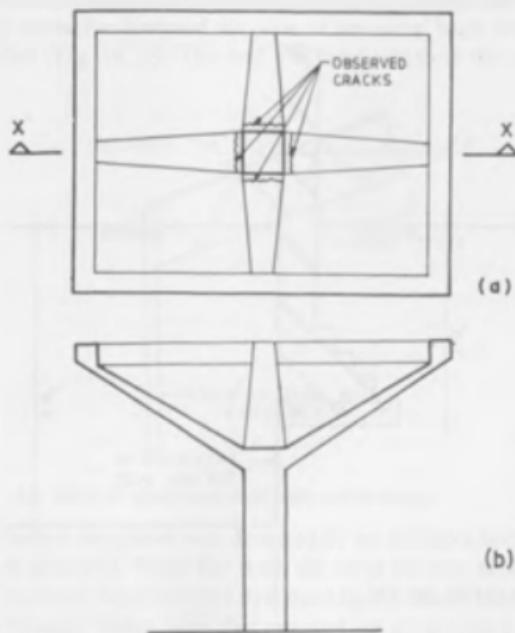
Petrol pump station structure. (a) Top plan of the hyper shell structure; (b) Section X-X.
